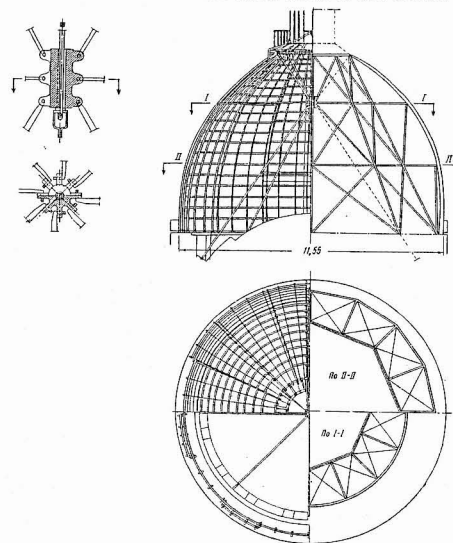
The small iron domes of Trinity cathedral, 1827-34: section, plans and details of the stabilising structure (from V.F. Ivanov, *Istoriya stroitel'noi tekhniki* (History of Building Technology), pp.324-25). The right-hand side of the section and plan show the design for the reconstruction of 1952.
